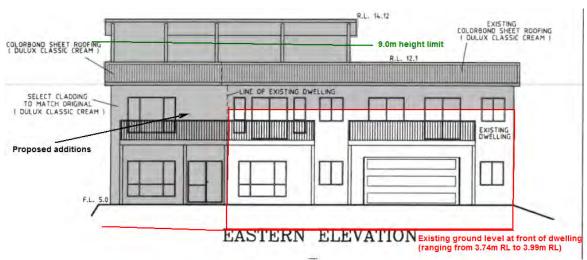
Eastern Elevation (Queen) depicting existing ground level, proposed additions and 9.0m height limit
